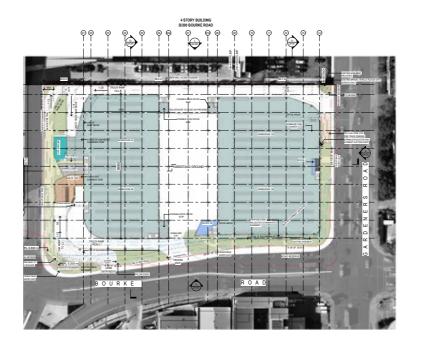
Proposed ground floor plan Source: Nettleton Tribe November 2021
